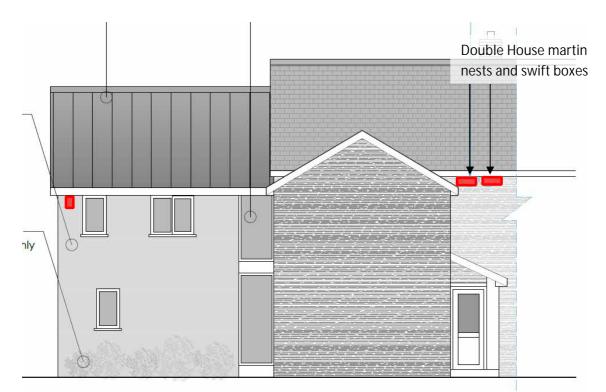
Northeast elevation of the proposed extension showing proposed location for an integrated bat box in proposed extension, and external house martin and swift nest boxes on the existing building.
